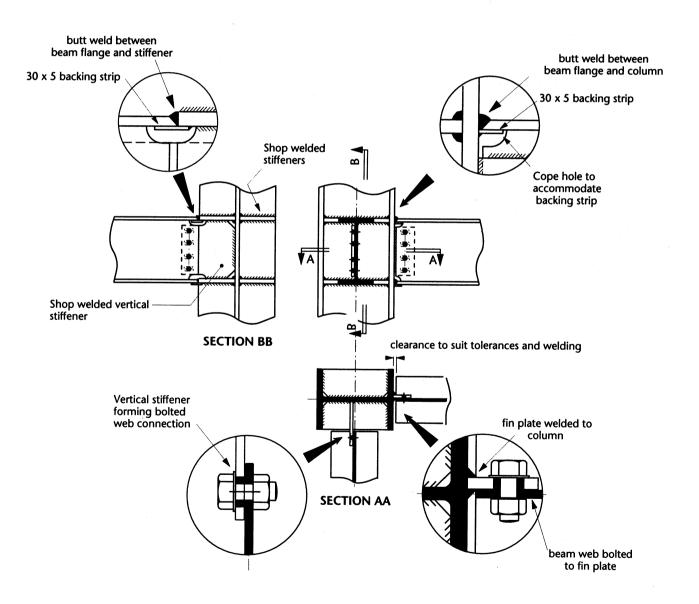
Site connection - flanges welded, web bolted
